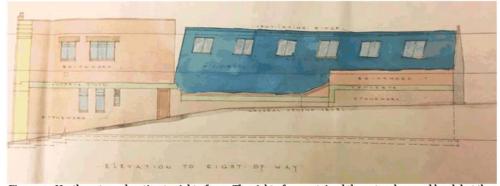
North eastern elevation to right of way. The right of way retained the natural ground level, but the extent of excavation for the garage floor level is shown, greater at the northern end and shallower towards
